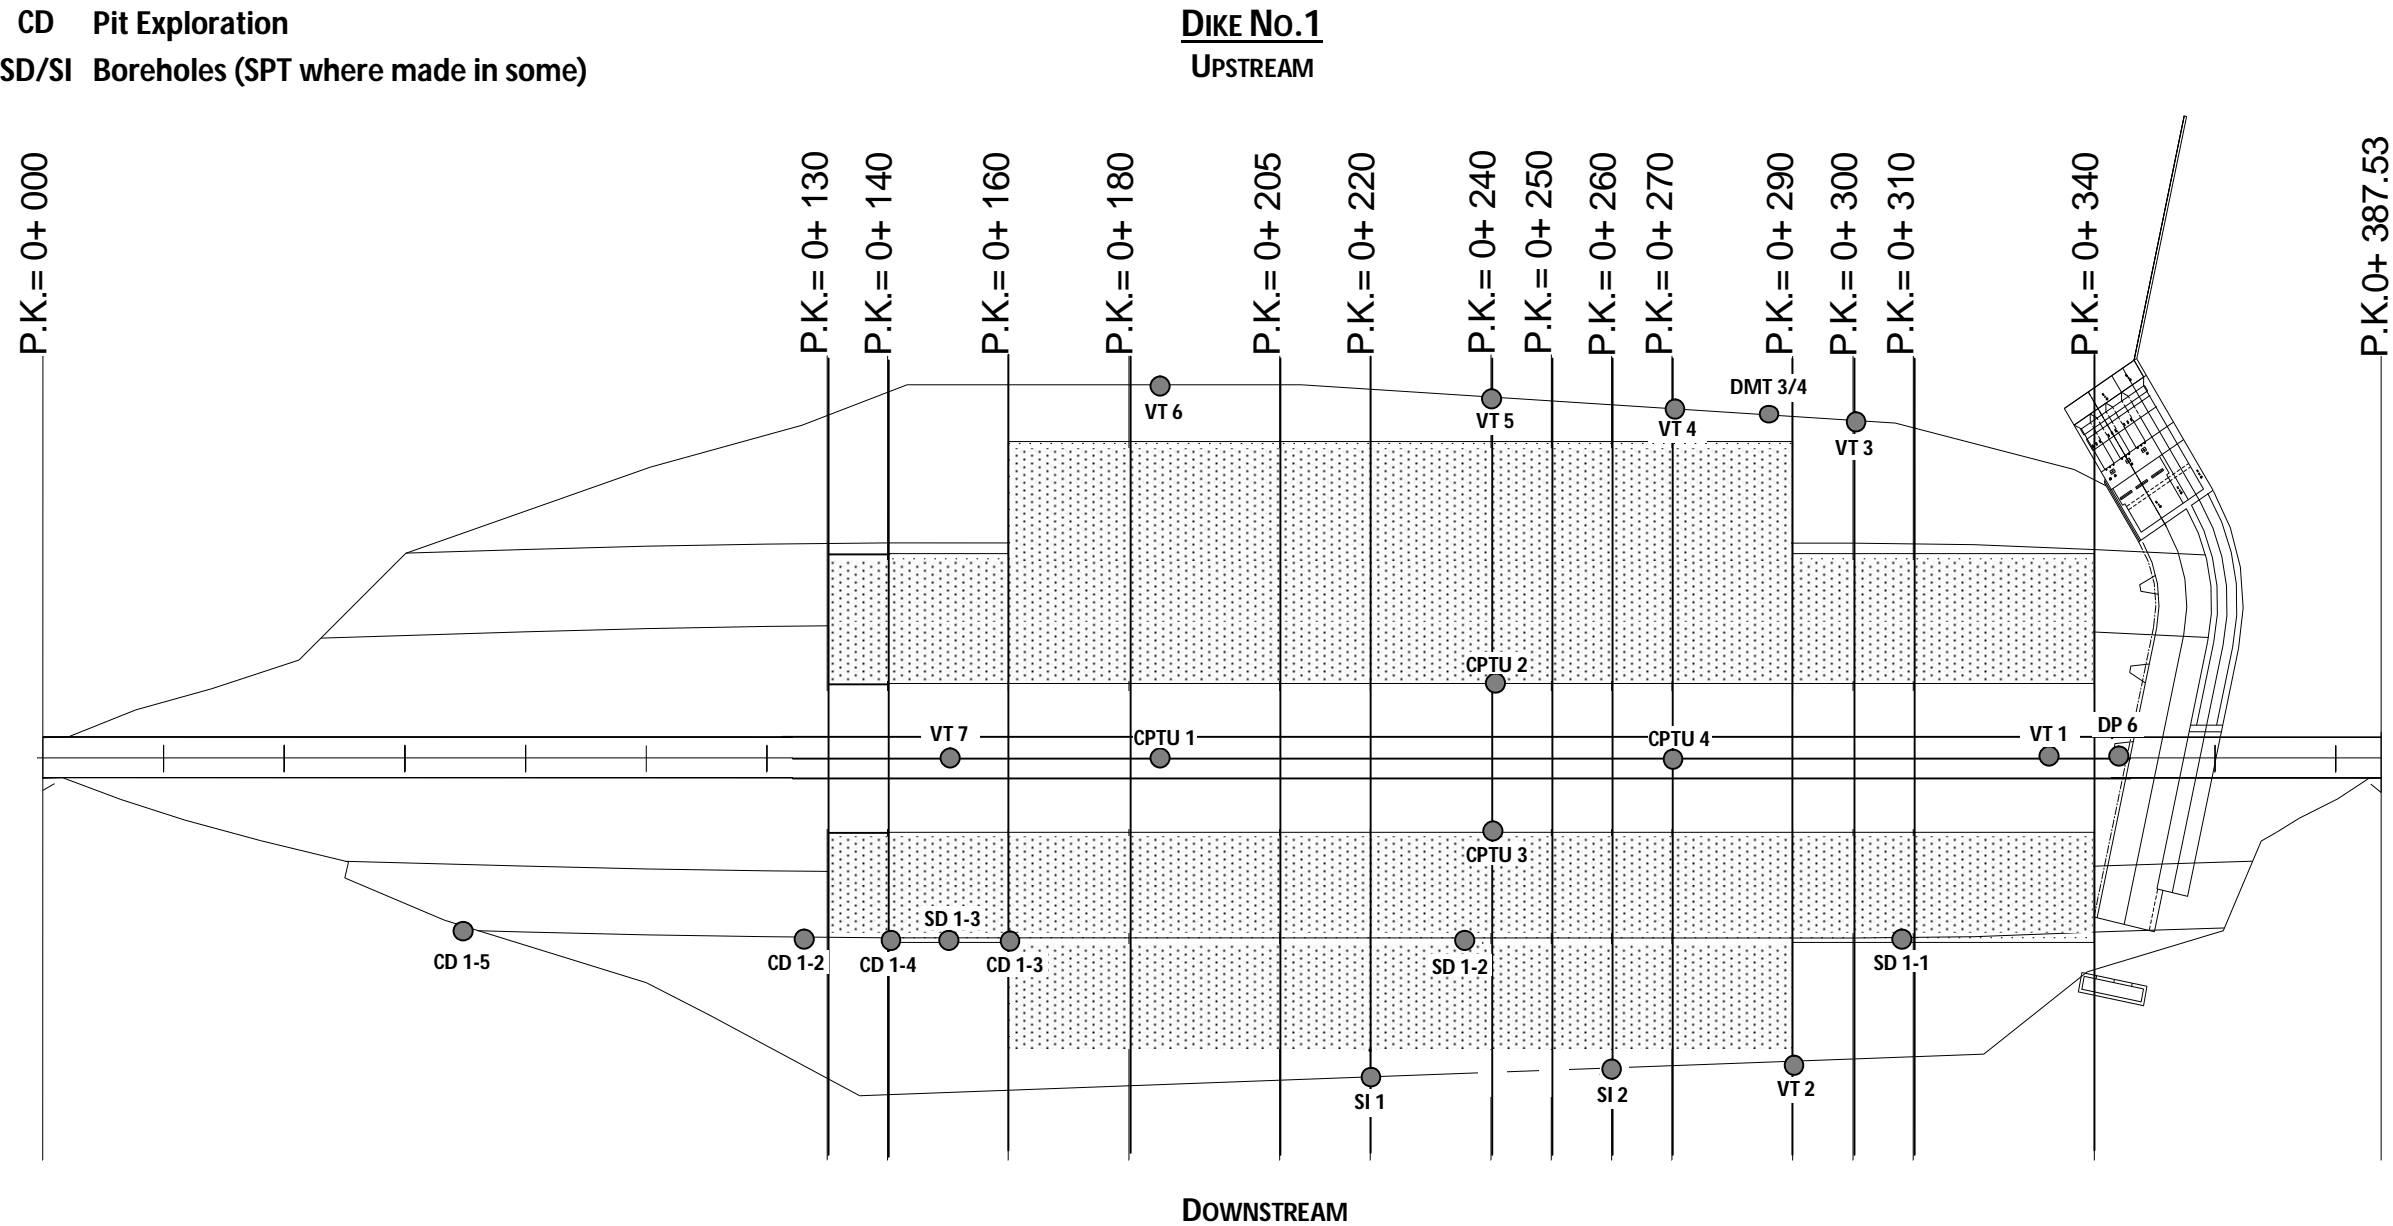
Plan showing the geotechnical prospecting made in DiKE No.1.
